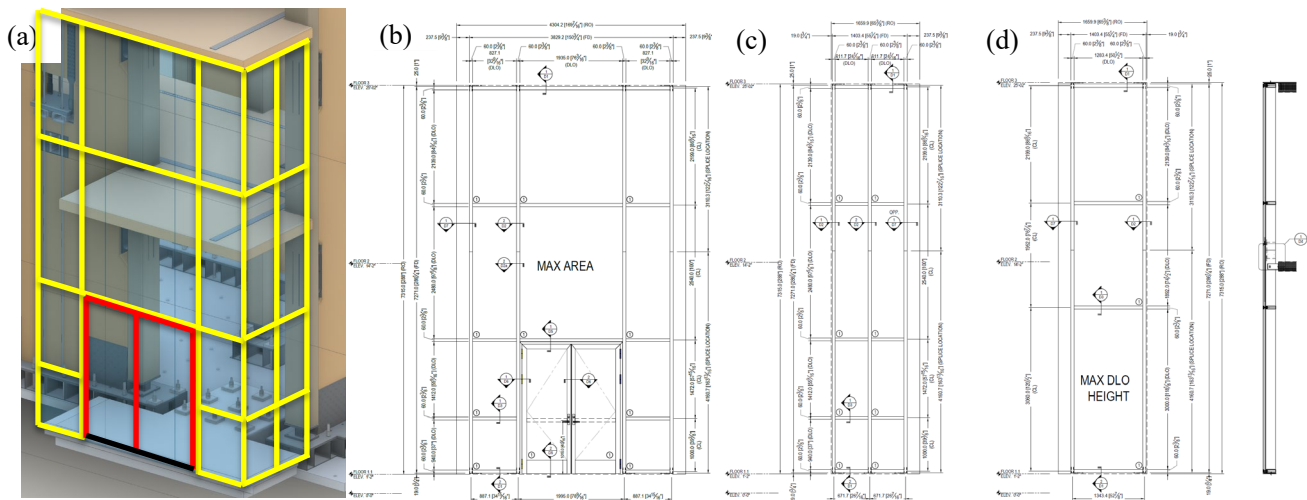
(a) 3D rendering of the curtain wall assembly and location of the floor connections and mullions; detailed (b) front view, (c) right side view, and (d) the left side view of the curtain wall assembly.
